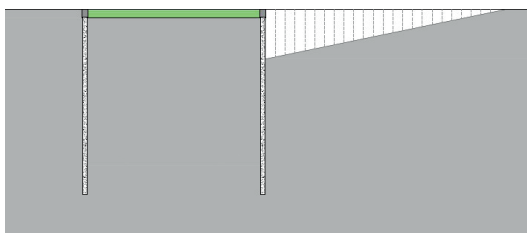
Schematic of the Second Phase - Excavation for Construction of the Roof Slab
